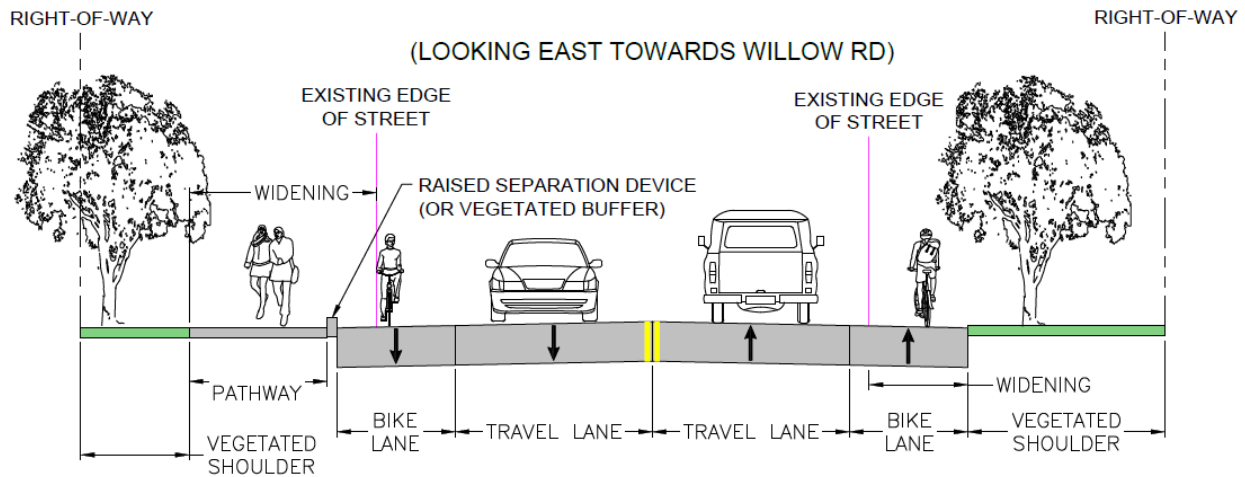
Coleman Avenue (Menlo Oaks) Long-term Alternative Cross Section
